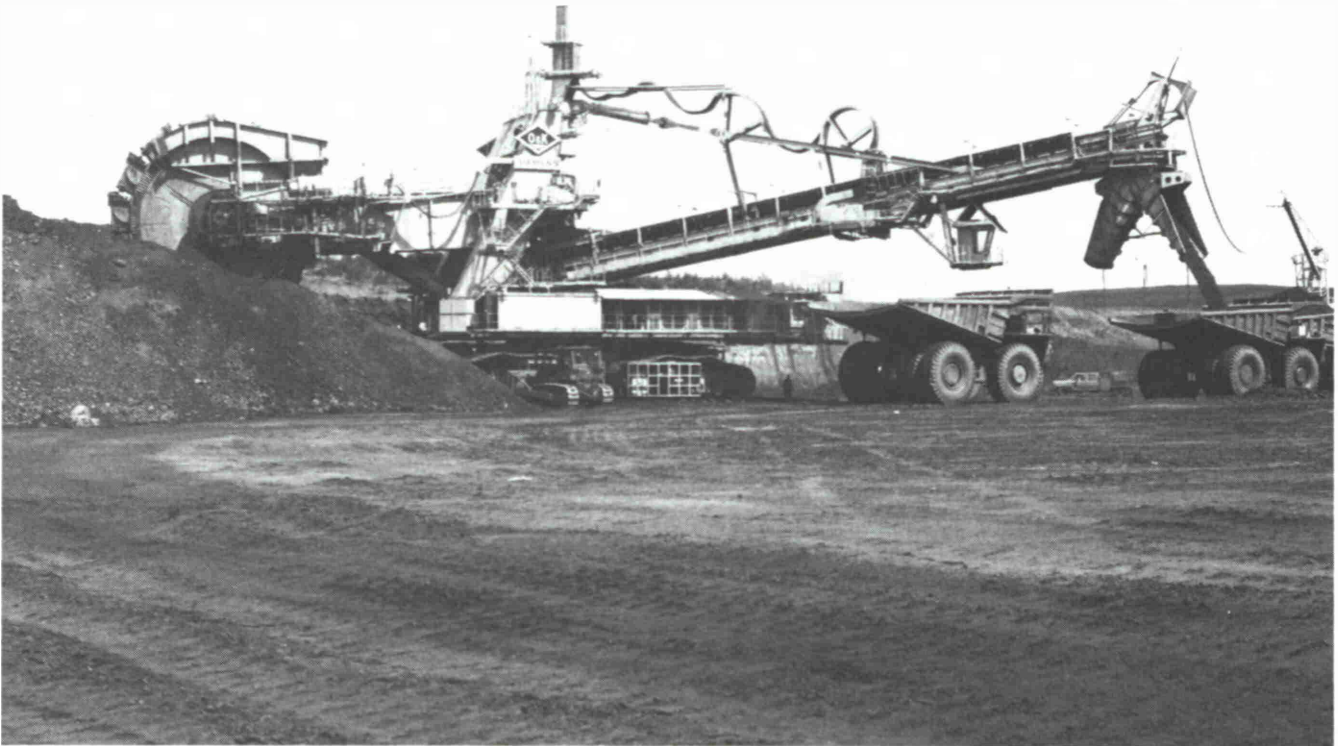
Bucket wheel excavator in the Canadian oil sand open-cut with long discharge belt and discharge chute
